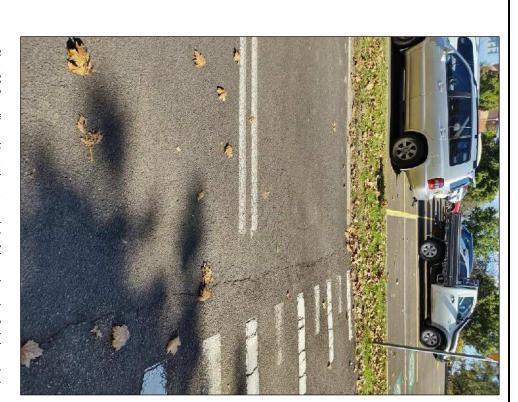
Crocodile cracking at the entrance/exit of the road crossing. Pothole repair also
